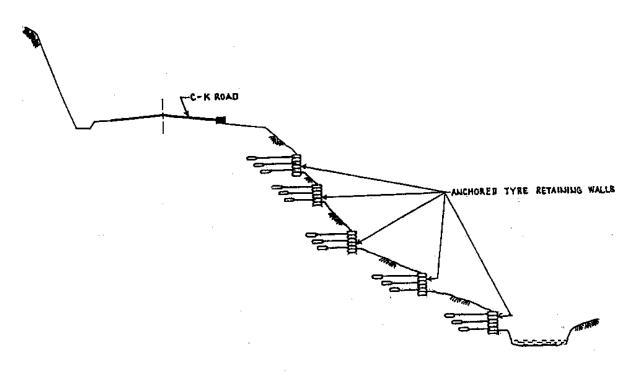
Cross section of the anchored tyre retaining walls on 86thkm Colombo-Kandy Road
